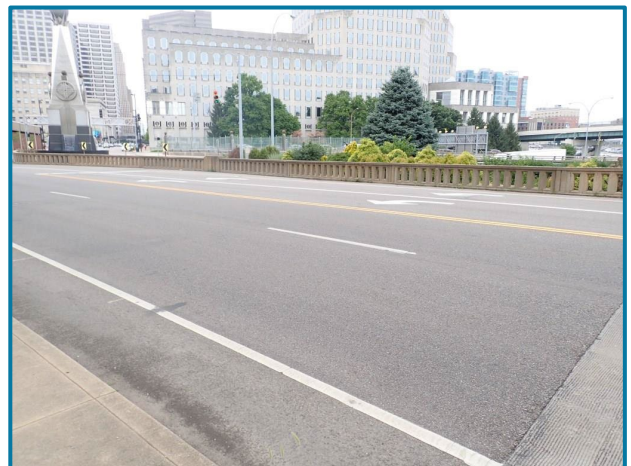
Approach pavement at the west end of the bridge (West Approach, looking northwest).
